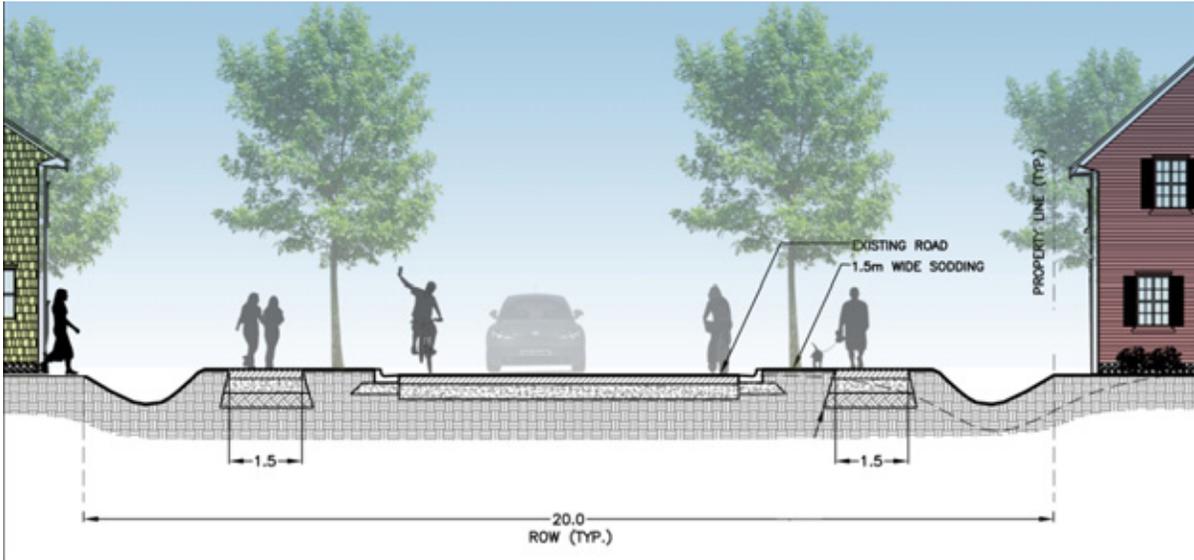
Cross Section of Curbed Road with Sidewalk
